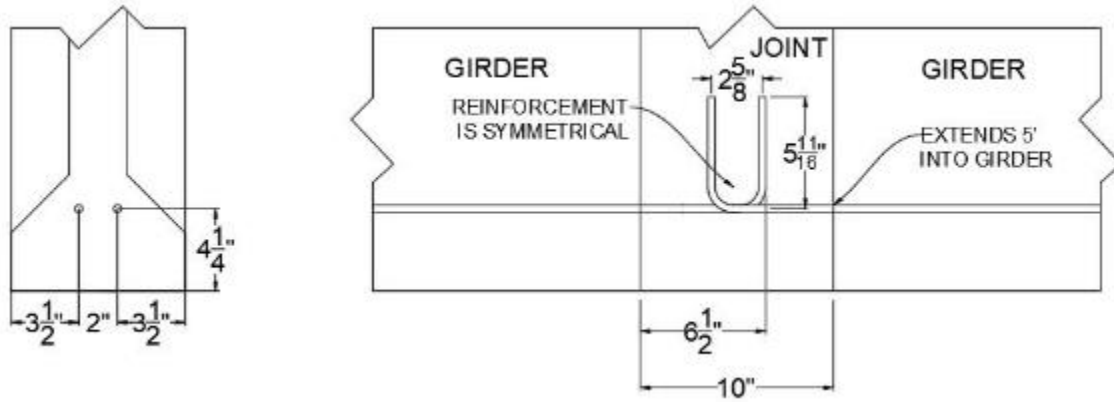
Newly constructed continuity joint mild steel detail for positive moment
